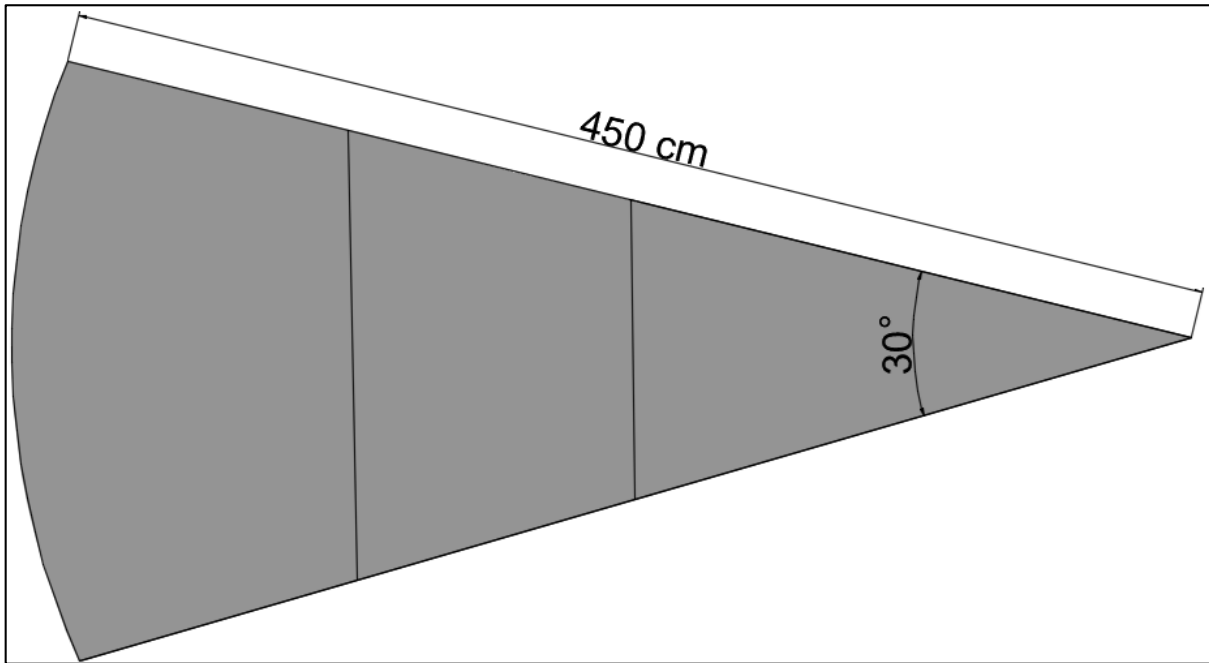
Top view of a convex dike segment with dimensions, opening angle.
